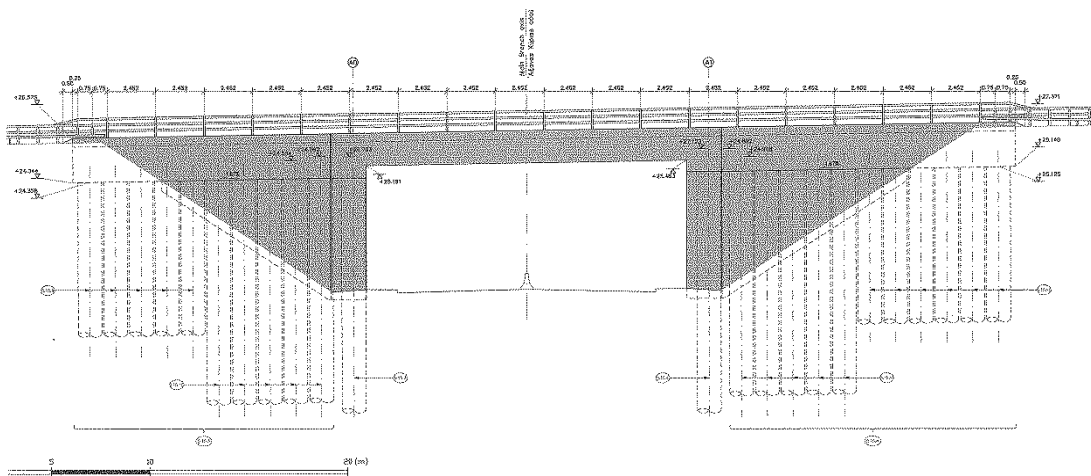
Plan view: Underpass case study (Source: Author’s proposal)
